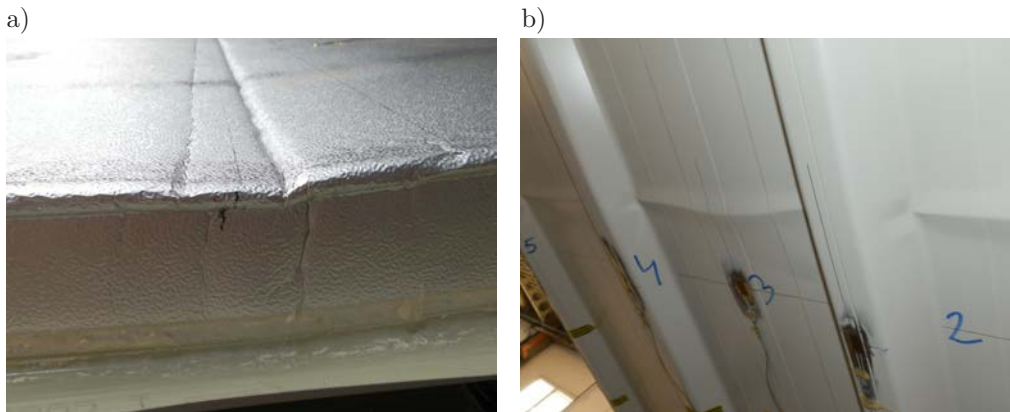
The damage mechanism in situation 2: a) local core crushing due to line loading, b) wrinkling of the steel face in the valleys.
